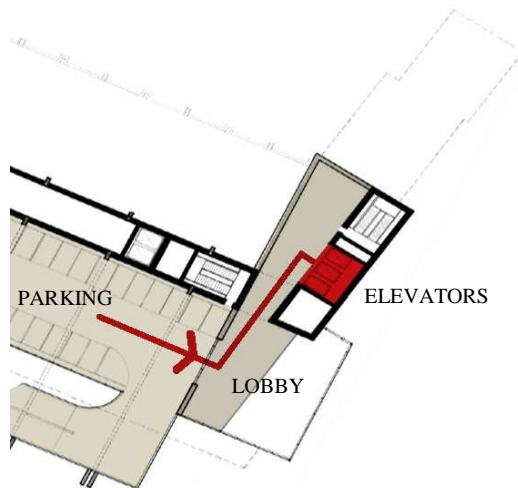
Parking and Upper Lobby: 2nd through 5th Floors.
